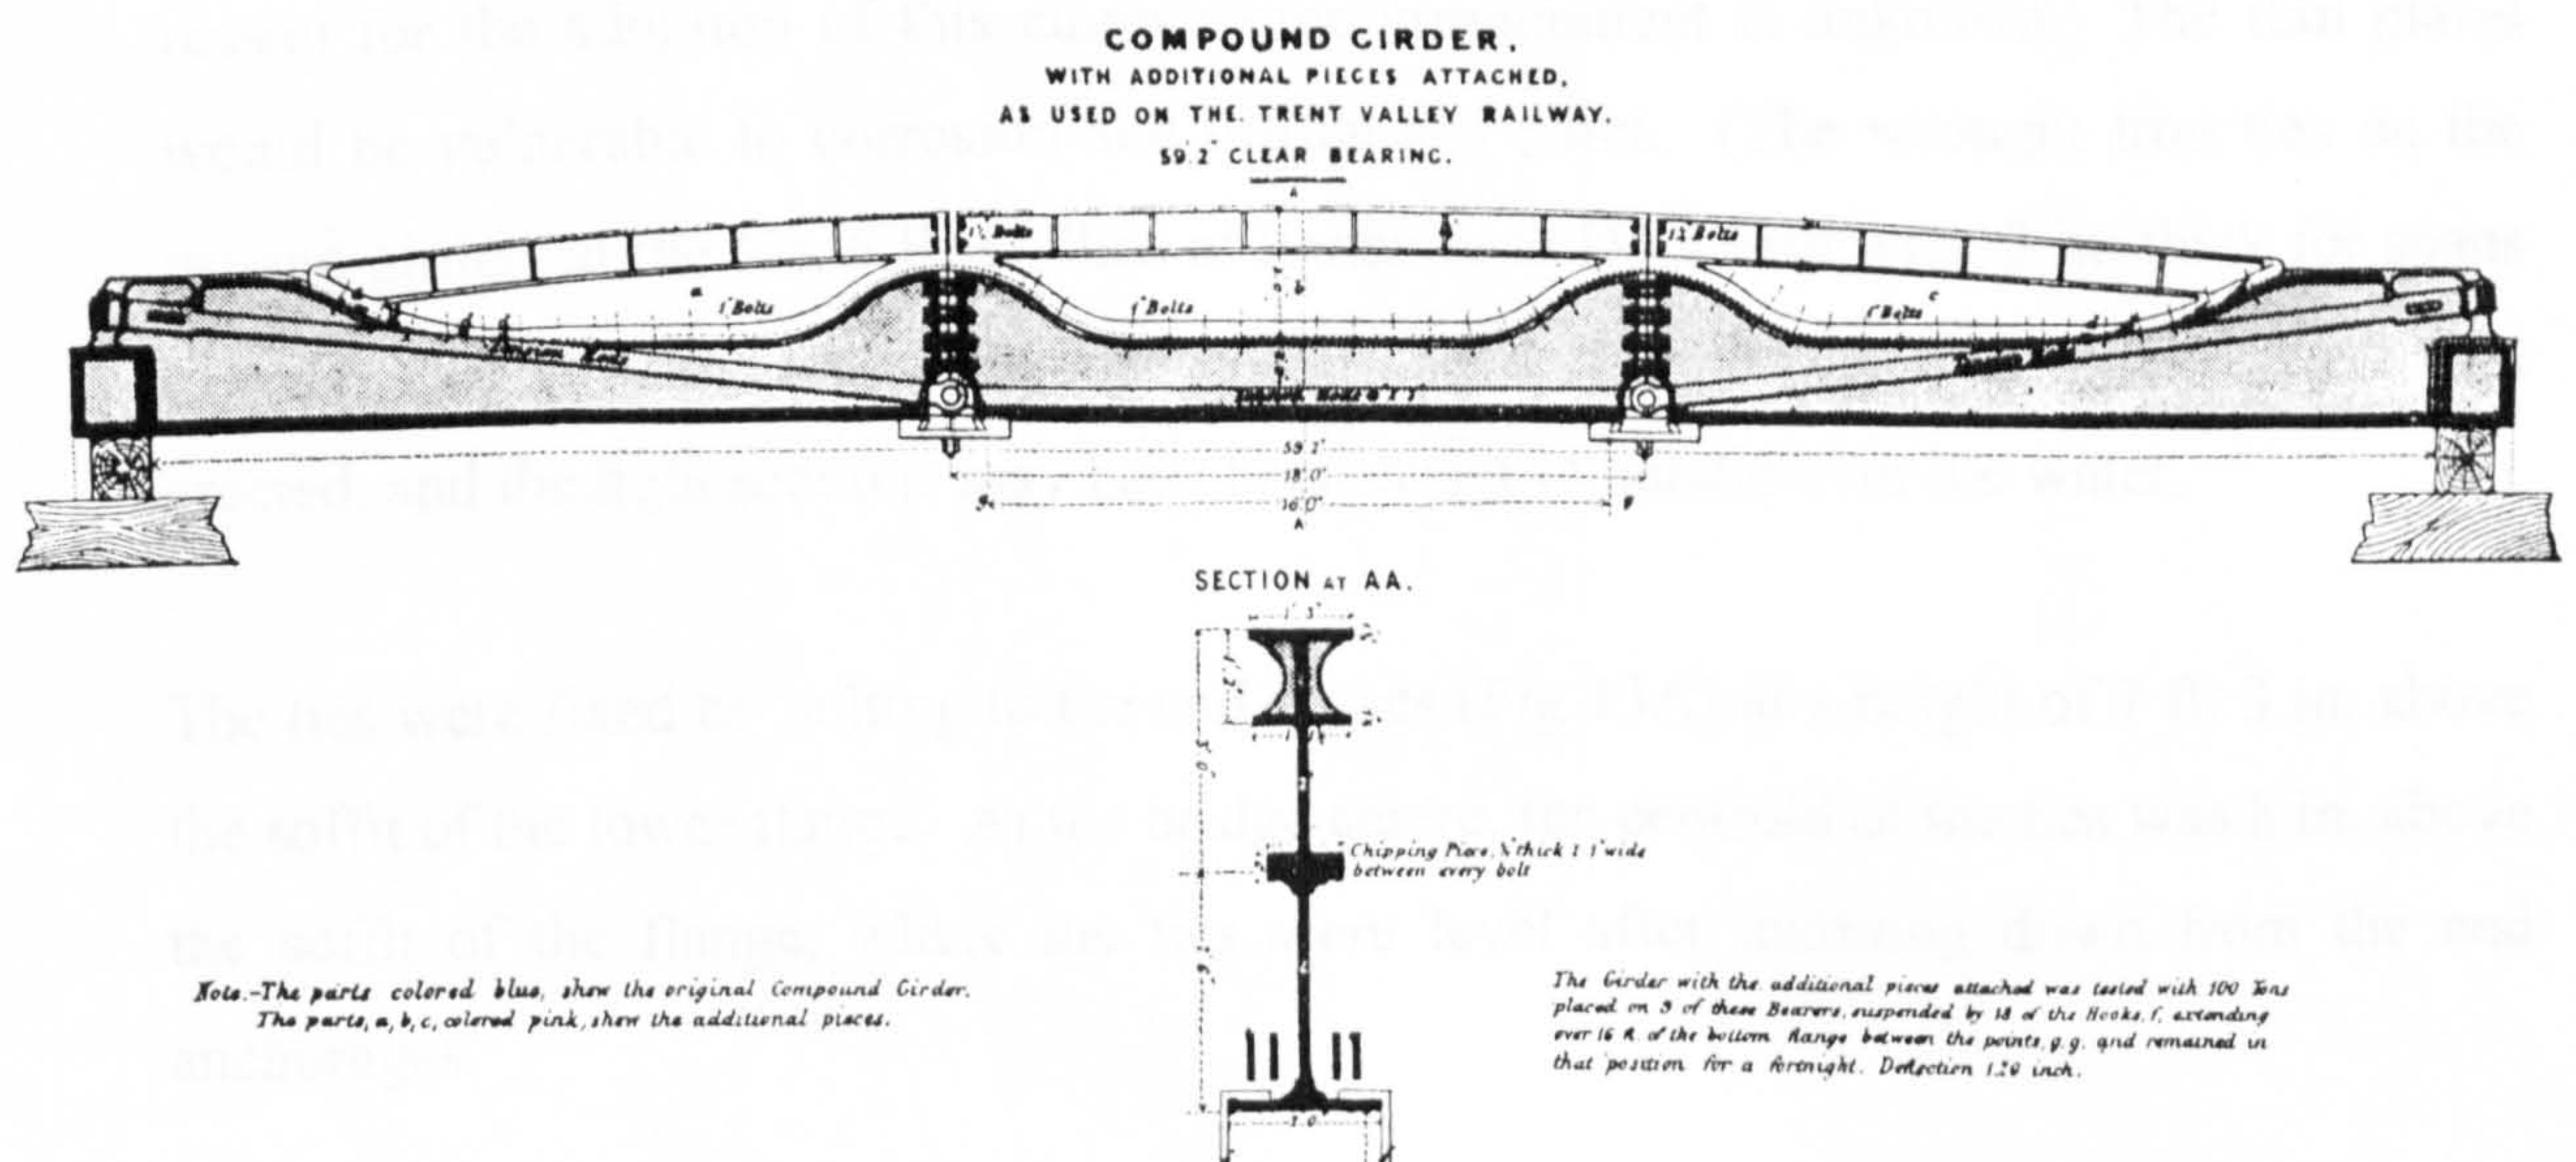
Elevation and cross-section of 60 ft. span trussed girder.
